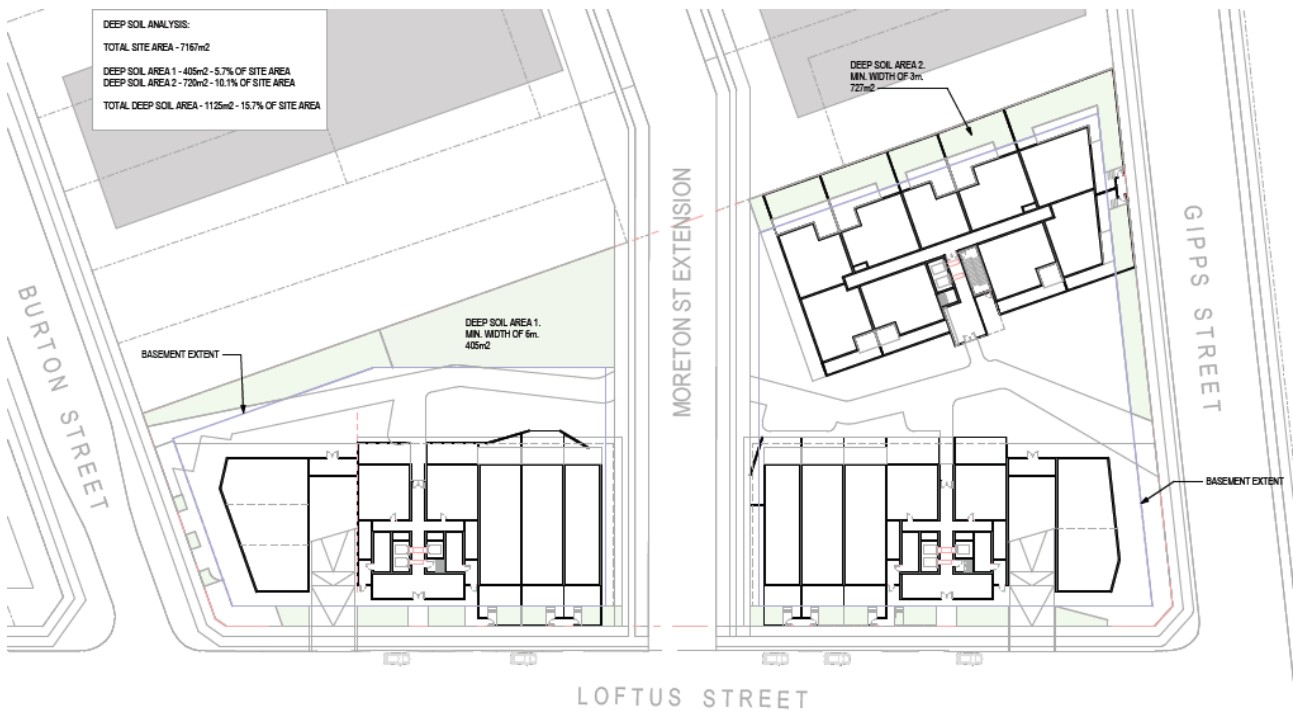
Estimated deep soil plan (Council PRCUTS Stage 2 Planning Proposal)
